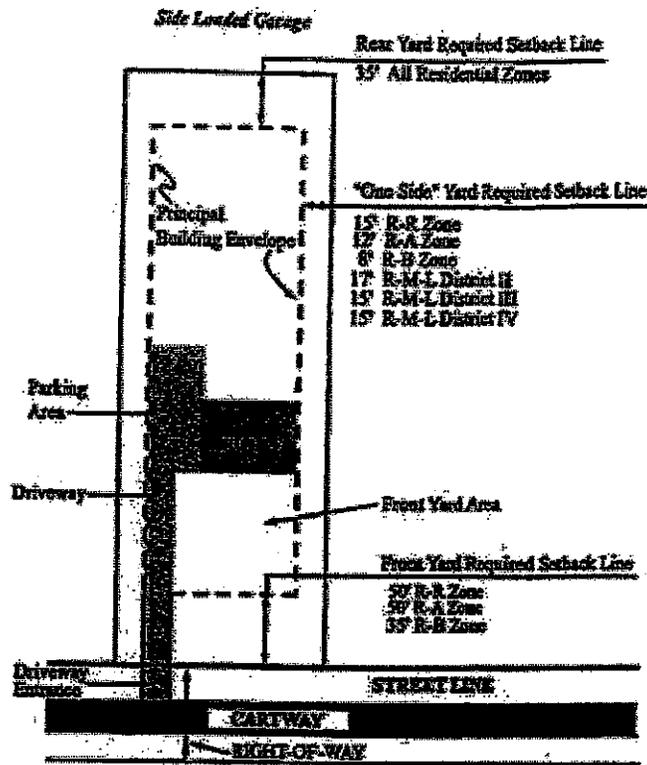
Required Setbacks, Yards, Principal Building Envelope (Section 28-203)
